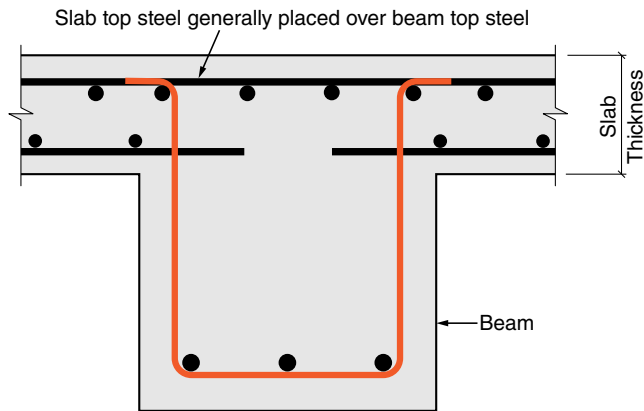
When slabs are supported on beams, construction documents should include a detail showing the placement of slab top reinforcing passing over a beam.
